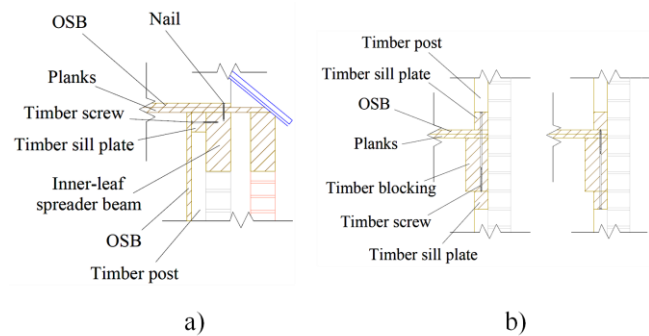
Sill plates-to-timber diaphragm connections details: a) transverse sides (North, South); b) longitudinal sides (East, West).
